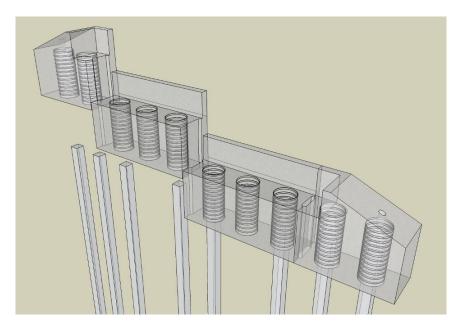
Transparent View of an Integral Abutment Showing Corrugated Pipe Voids
